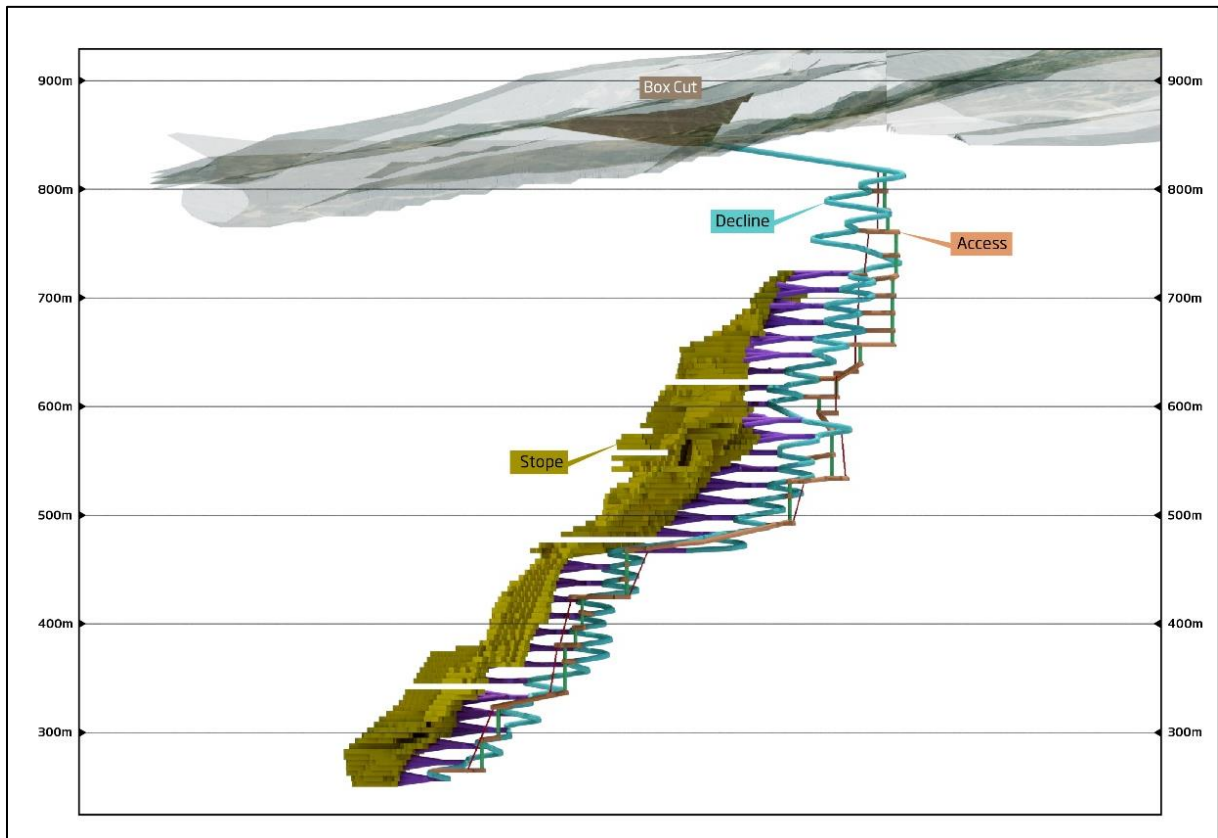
Korudanlık Deposit Mining Layout Section Looking East
